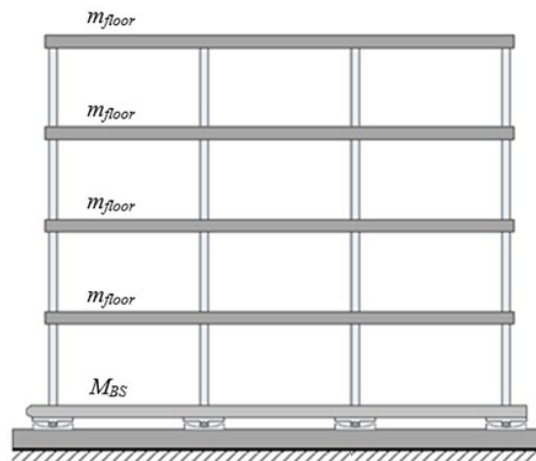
Section of the case-study building, isolated with FPSs; m_{floor} is the mass of each floor and M_{BS} is the mass of the base slab
